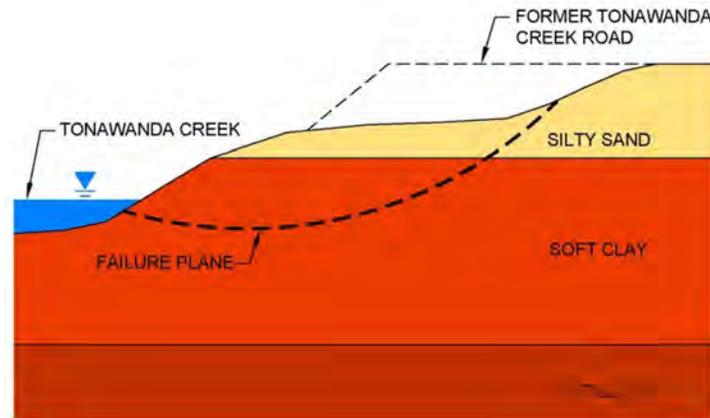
Simplified subsurface profile at Tonawanda Creek Road failure
